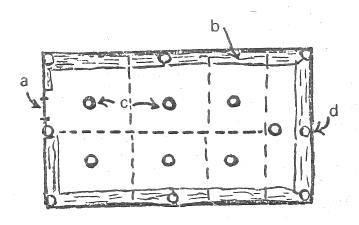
Arrangement of interior of Jim Eldridge's gable-roof house, Old Lummi Village, circa 1880.
